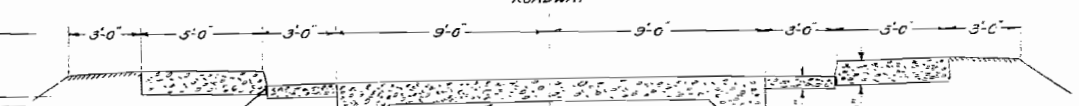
DETAIL OF SIDEWALK AND GUTTER AT OVERHEAD STRUCTURE
